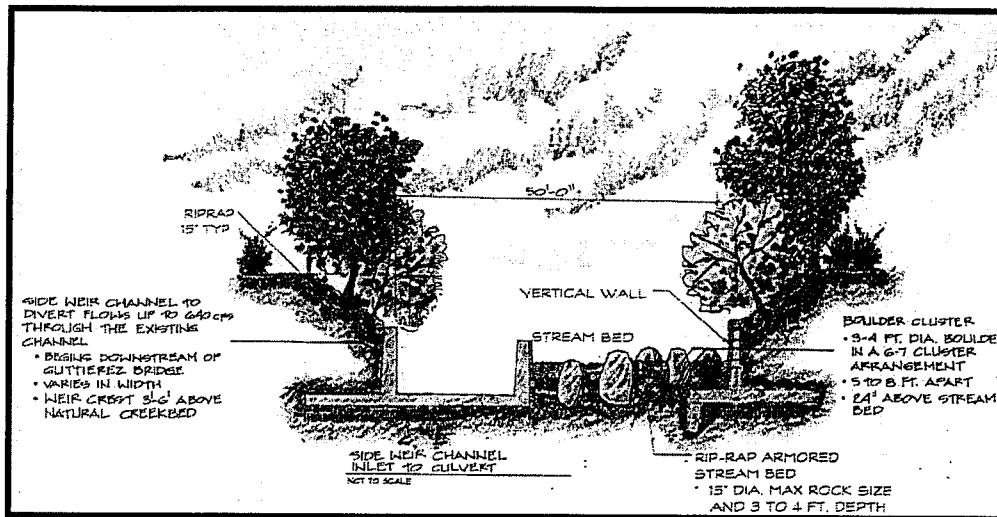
Representative Cross Section of Side Weir Channel Inlet to Overflow Culvert (Looking Downstream).
